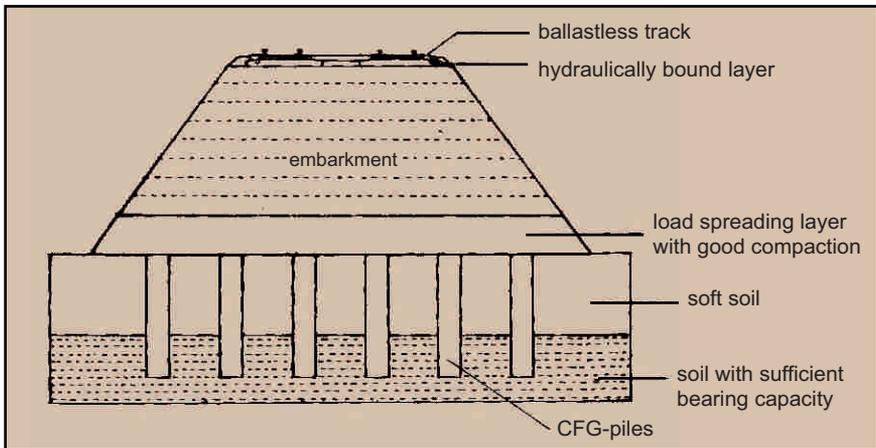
CFG Piles for subsoil improvement (Cement Fly ash Gravel piles)
